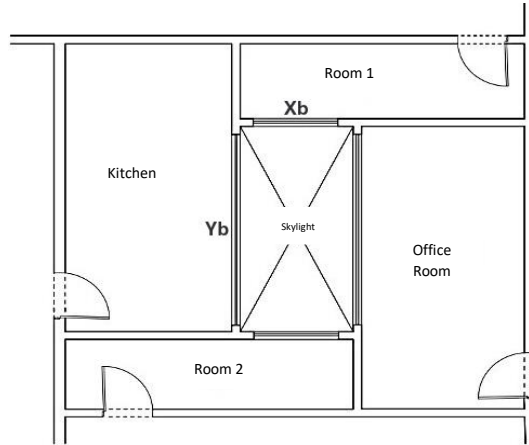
Partial plan sketch of building B (B Binasının Kısmi Planı)
